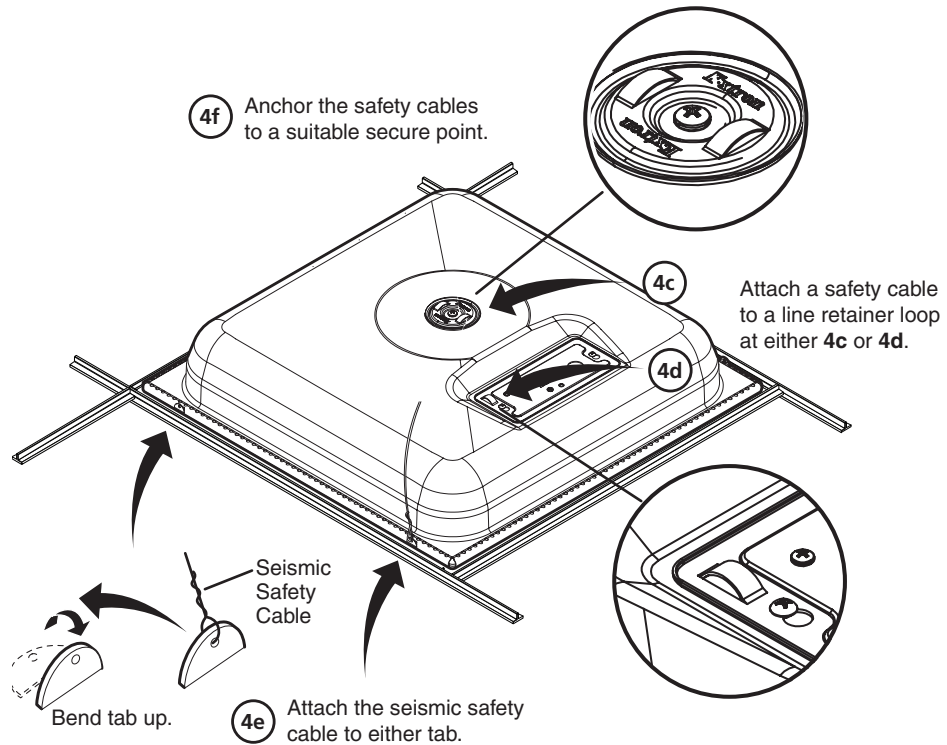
2 Feet x 4 Feet Ceiling Tile Installation
